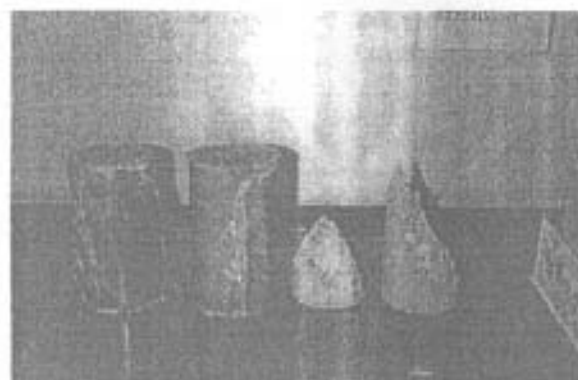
Failure modes of the concrete cylinder CWC200-1.
